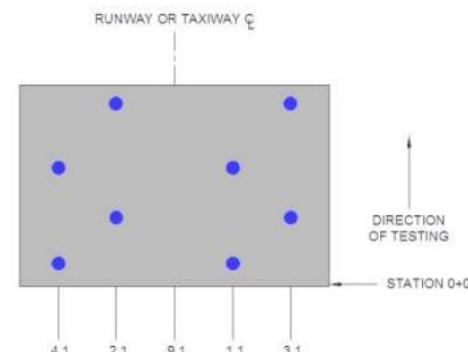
Example Runway or Taxiway Sketch for HMA Pavements
